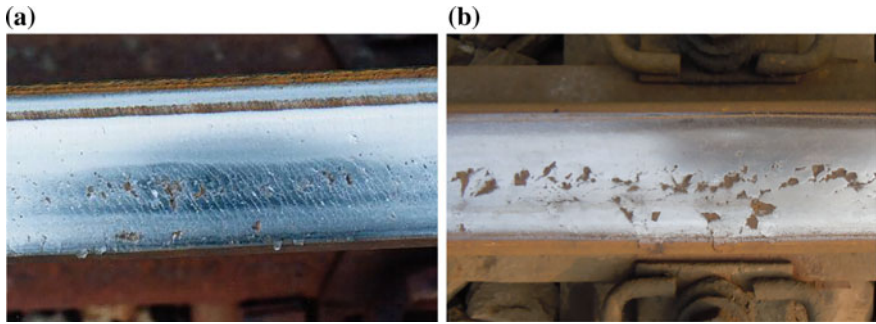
Gauge corner cracks: a minor ones (ARTC 2006) and b severe ones with spallings
